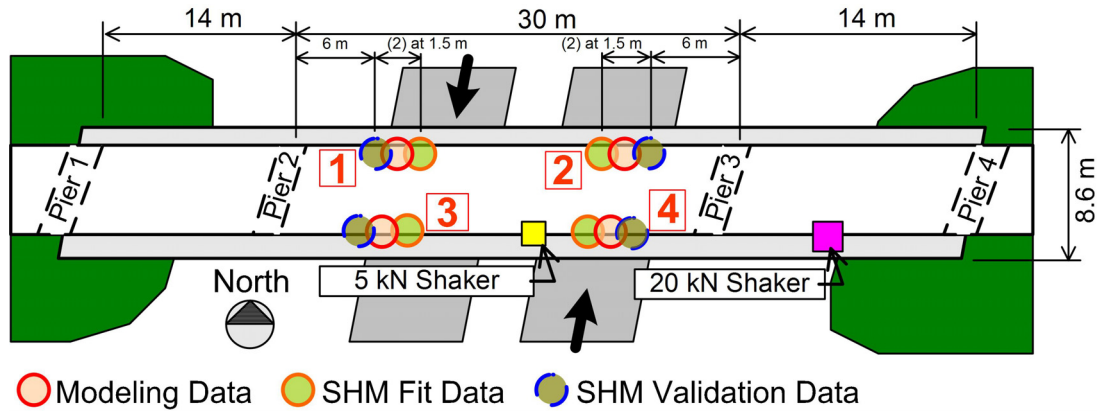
Sensor Layout of accelerometers on the Z24 bridge.
